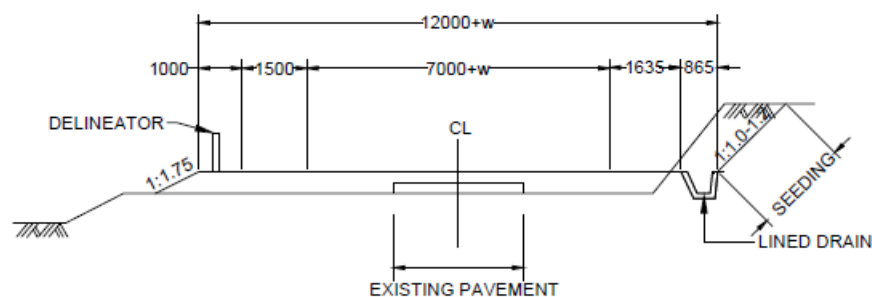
(3): Typical Cross Section – Type 3 (Formation in Cutting and Embankment)
